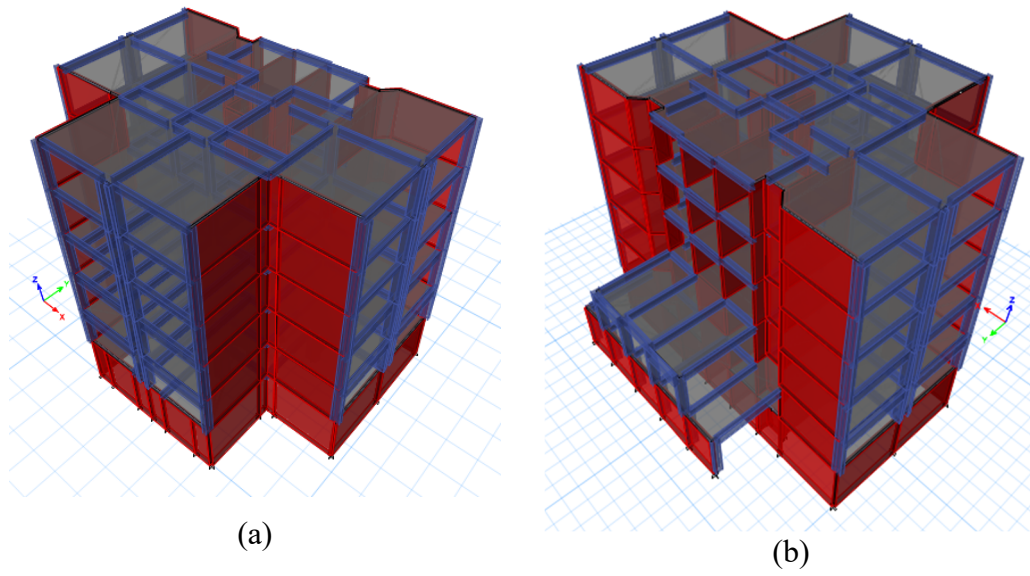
3-D views of the finite element model of the post-retrofit building from (a) SE and (b) NW corners.
